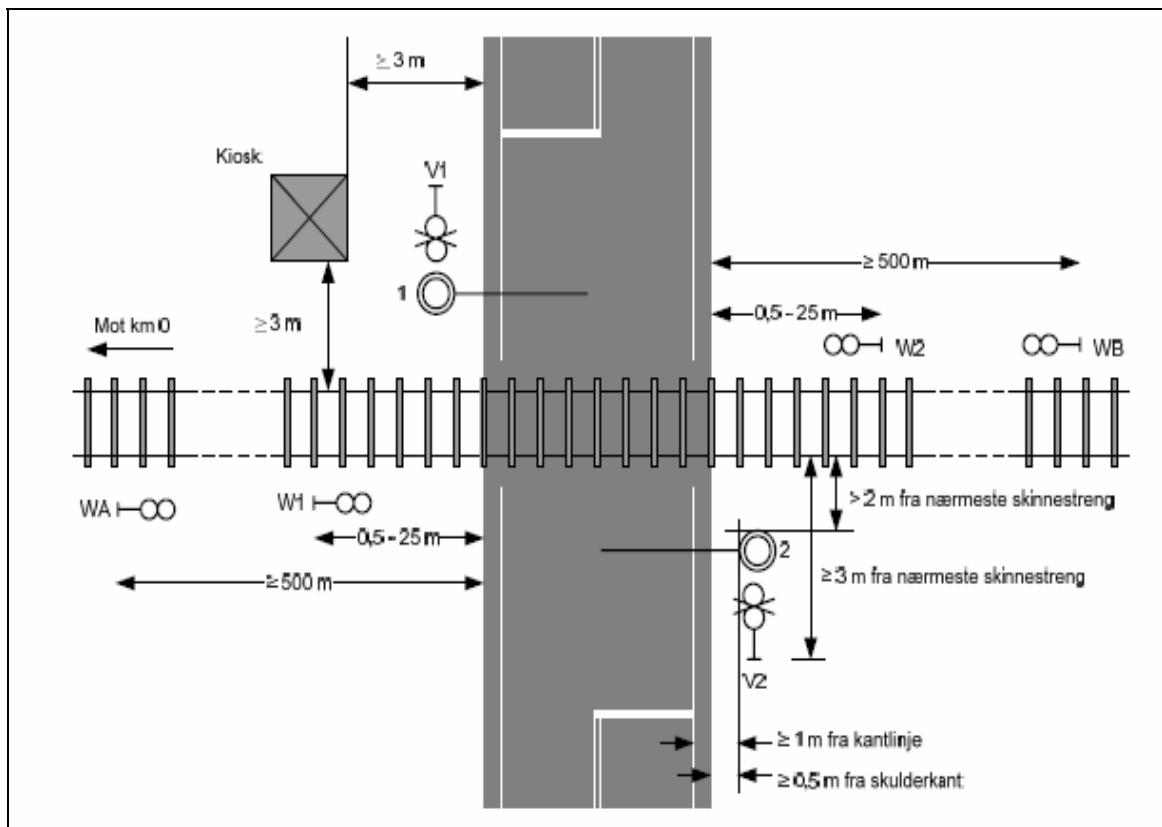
Location of equipment for road traffic signalling system (from JD550).
